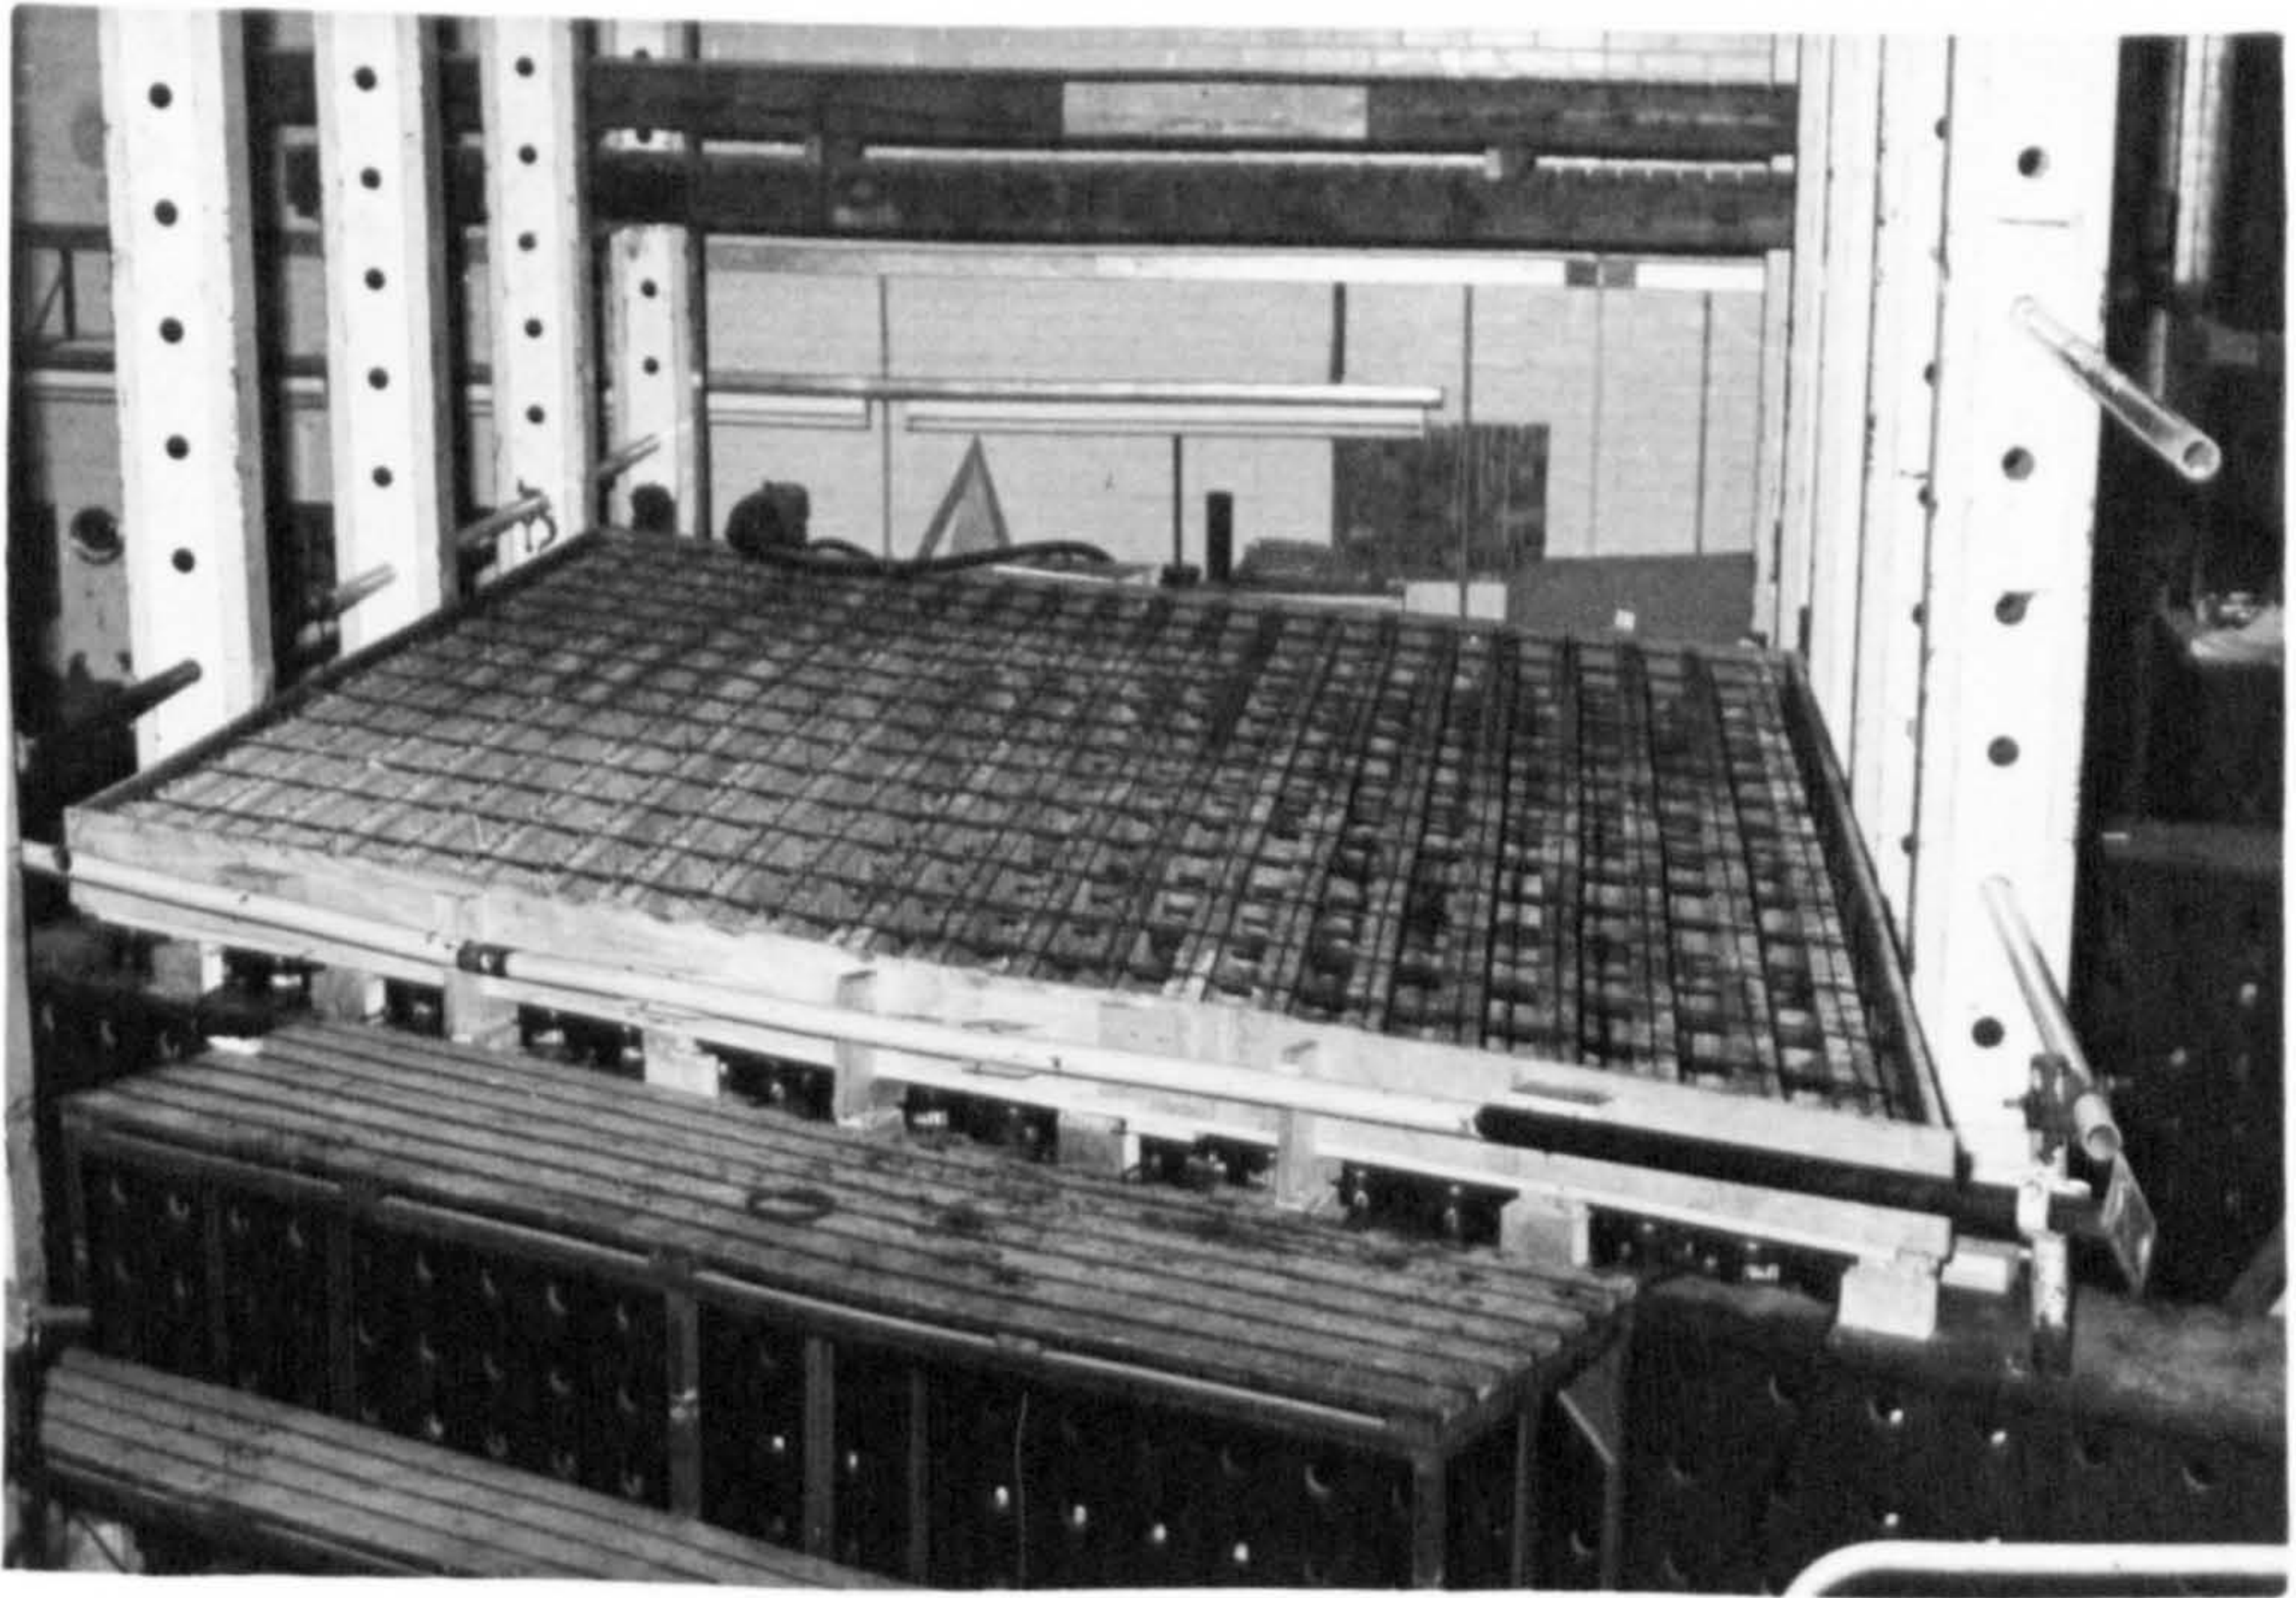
NON-PRESTRESSED REINFORCEMENT AND IN-SITU CASTING
